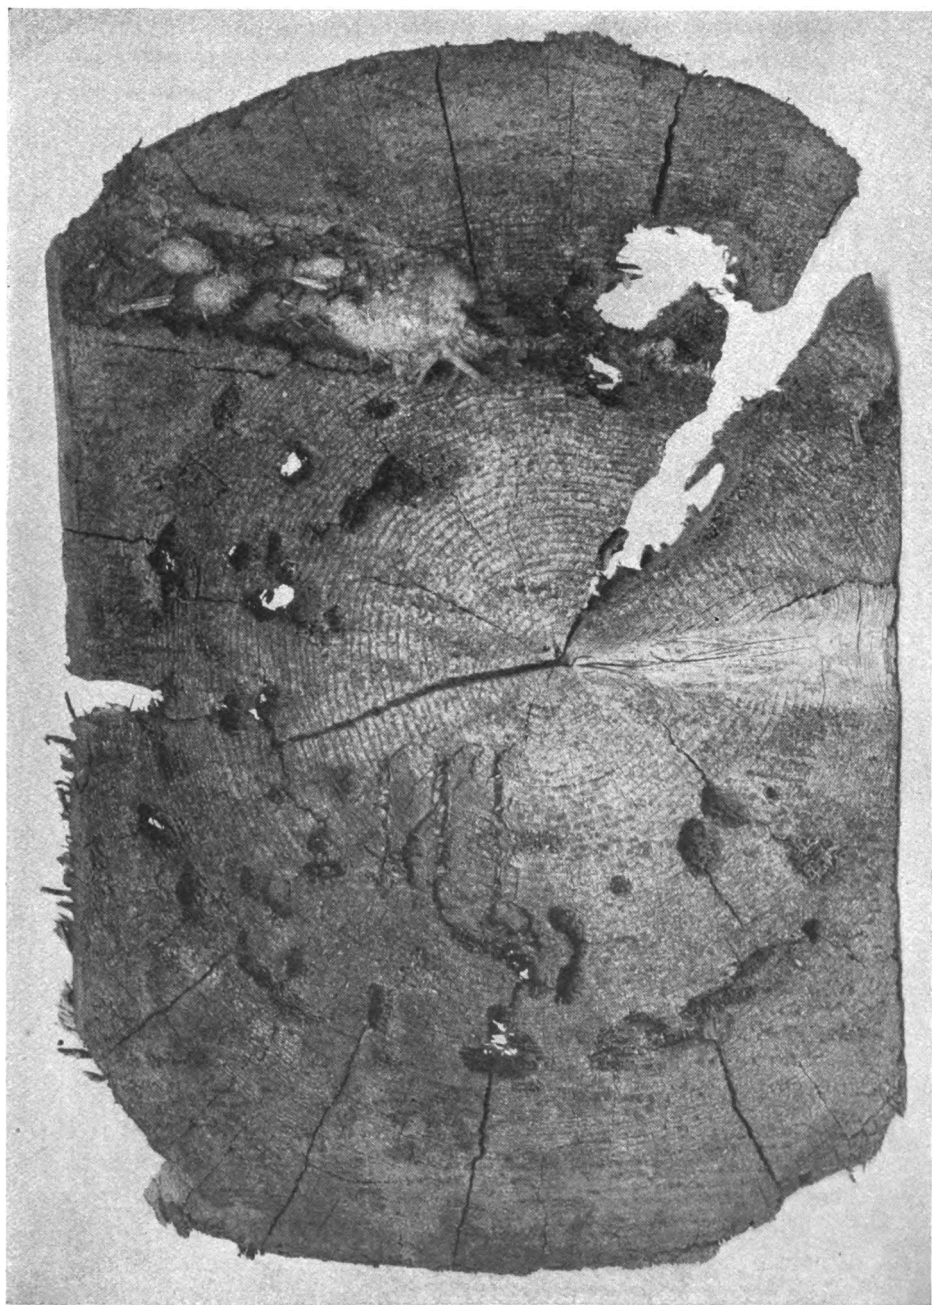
Section of railroad tie injured by Timber Worms. Specimen from same place as Figure 10.
